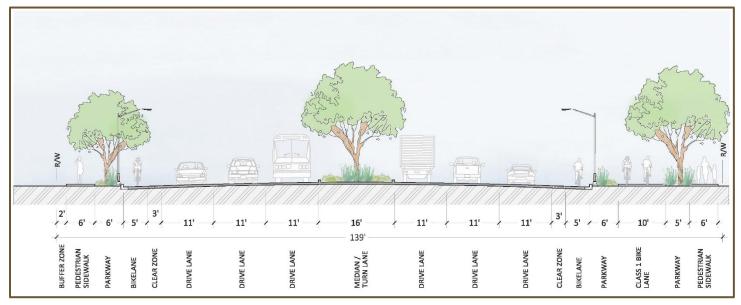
Airway Road Streetscape – 6-Lane Major
